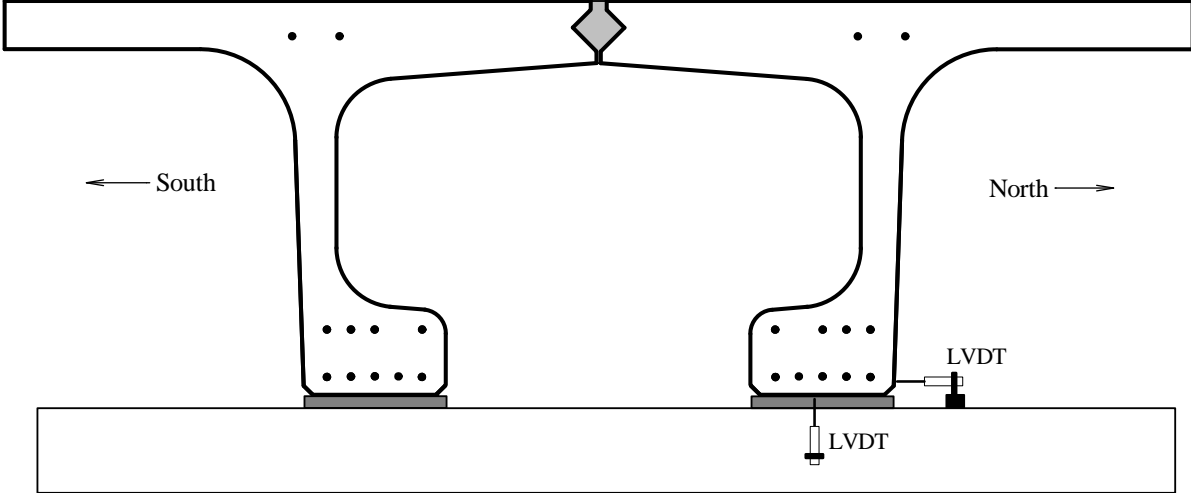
Illustration. Abutment LVDT locations for Test T1J and Test T2J.
